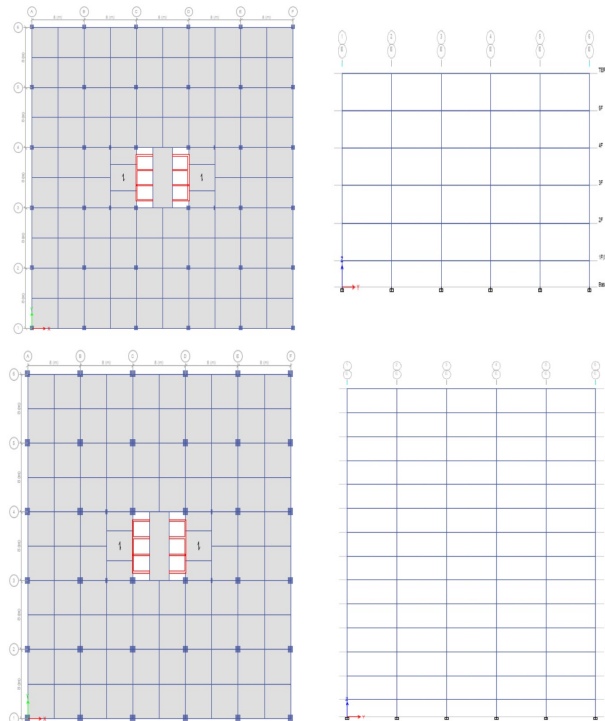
Plan and Elevation of 6Floor and 14 Floor building
